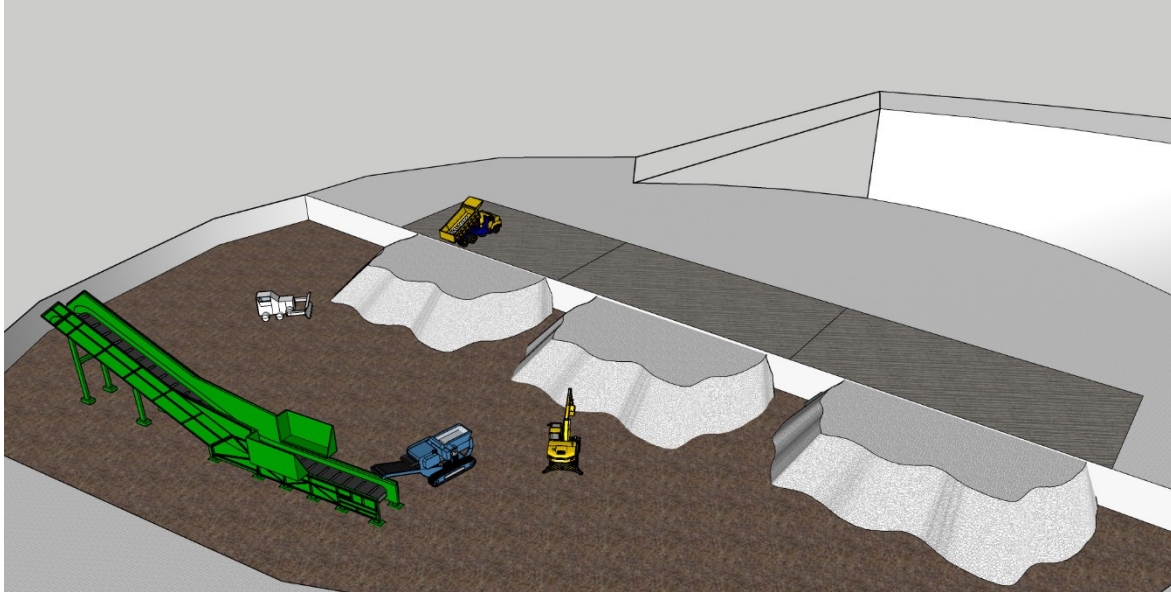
A typical pit bottom layout of the near face stockpile mining method
